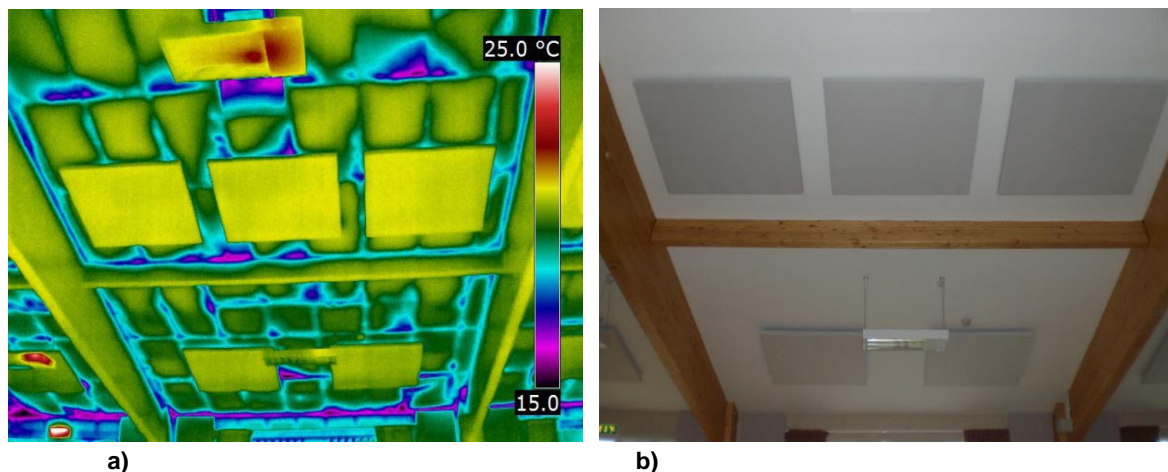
(a) Main hall ceiling (centre) thermogram. Note: Cold areas are evident on the ceiling skim finish / plasterboard layer. The cause of this is likely to be behind these construction elements from cold air leakage between the edges of the structurally insulated panels (sip's) as they are probably not well butted together. Furthermore in some areas there may also be a space between the plasterboard and the adjacent sip which is creating cold voids. Similar thermal phenomena were also found in the Parish Room and the Office ceilings. Confirmation of this may be possible if access into one of these areas can be obtained via a suitably located electrical fitting and a fiberscope. (b) Main hall ceiling (centre) digital photograph
